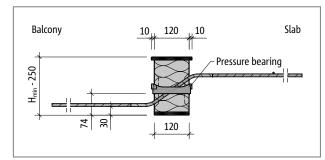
Schöck Isokorb® XT type Q-V5 to Q-V8: Product section
